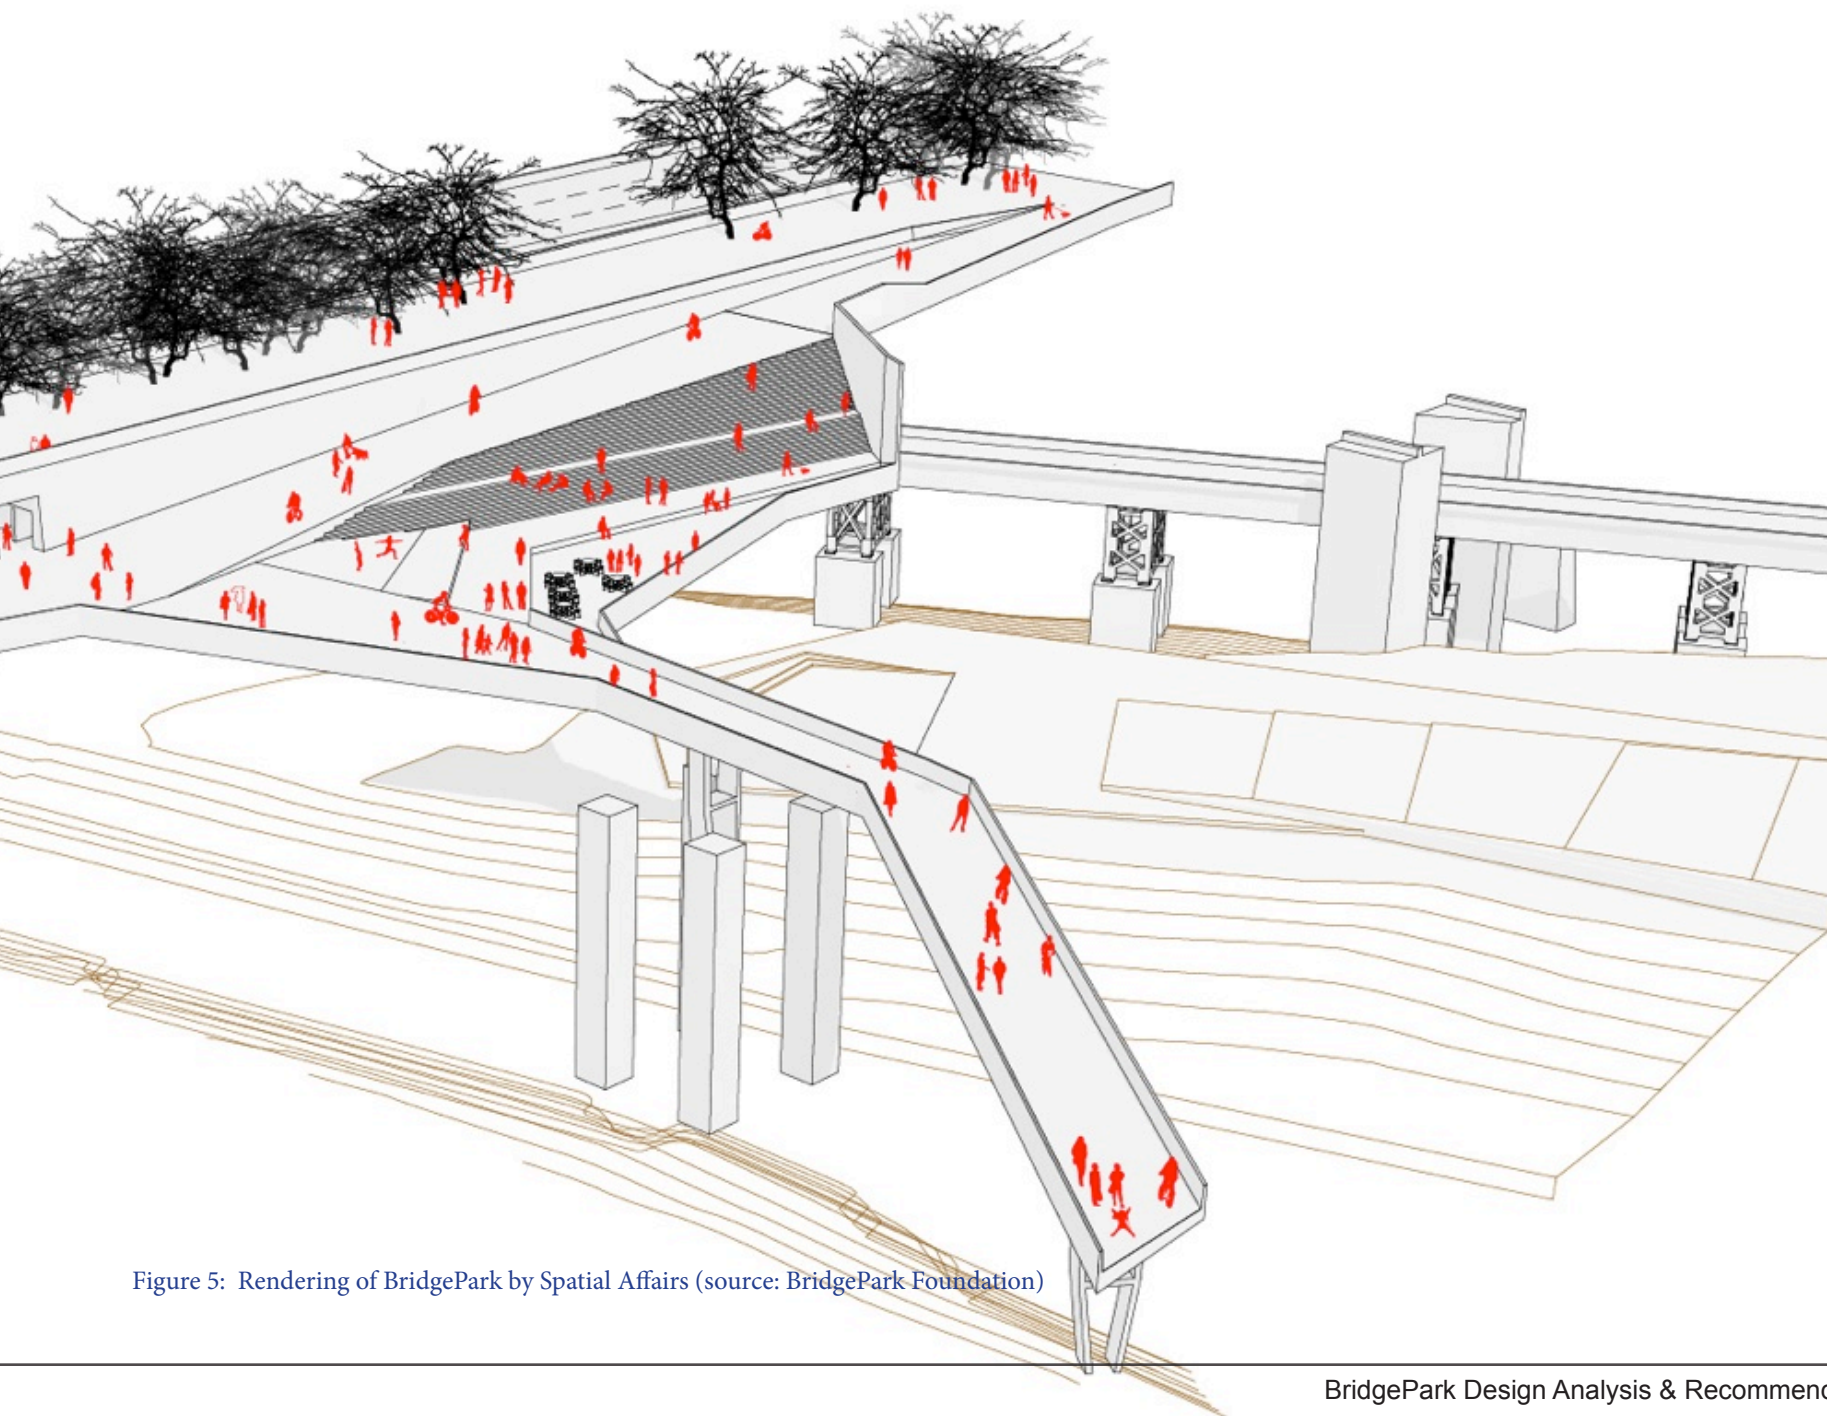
Rendering of BridgePark by Spatial Affairs (source: BridgePark Foundation)
